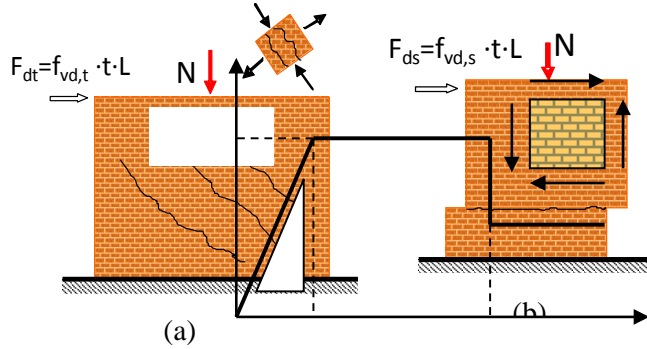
Shear failure, a) diagonal cracking, b) sliding
